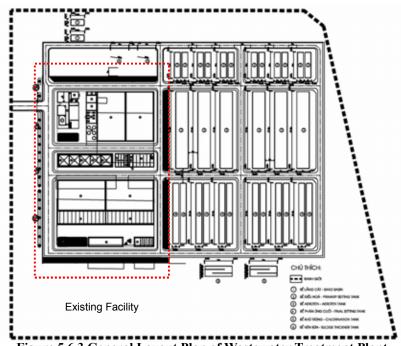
General Layout Plan of Wastewater Treatment Plant
